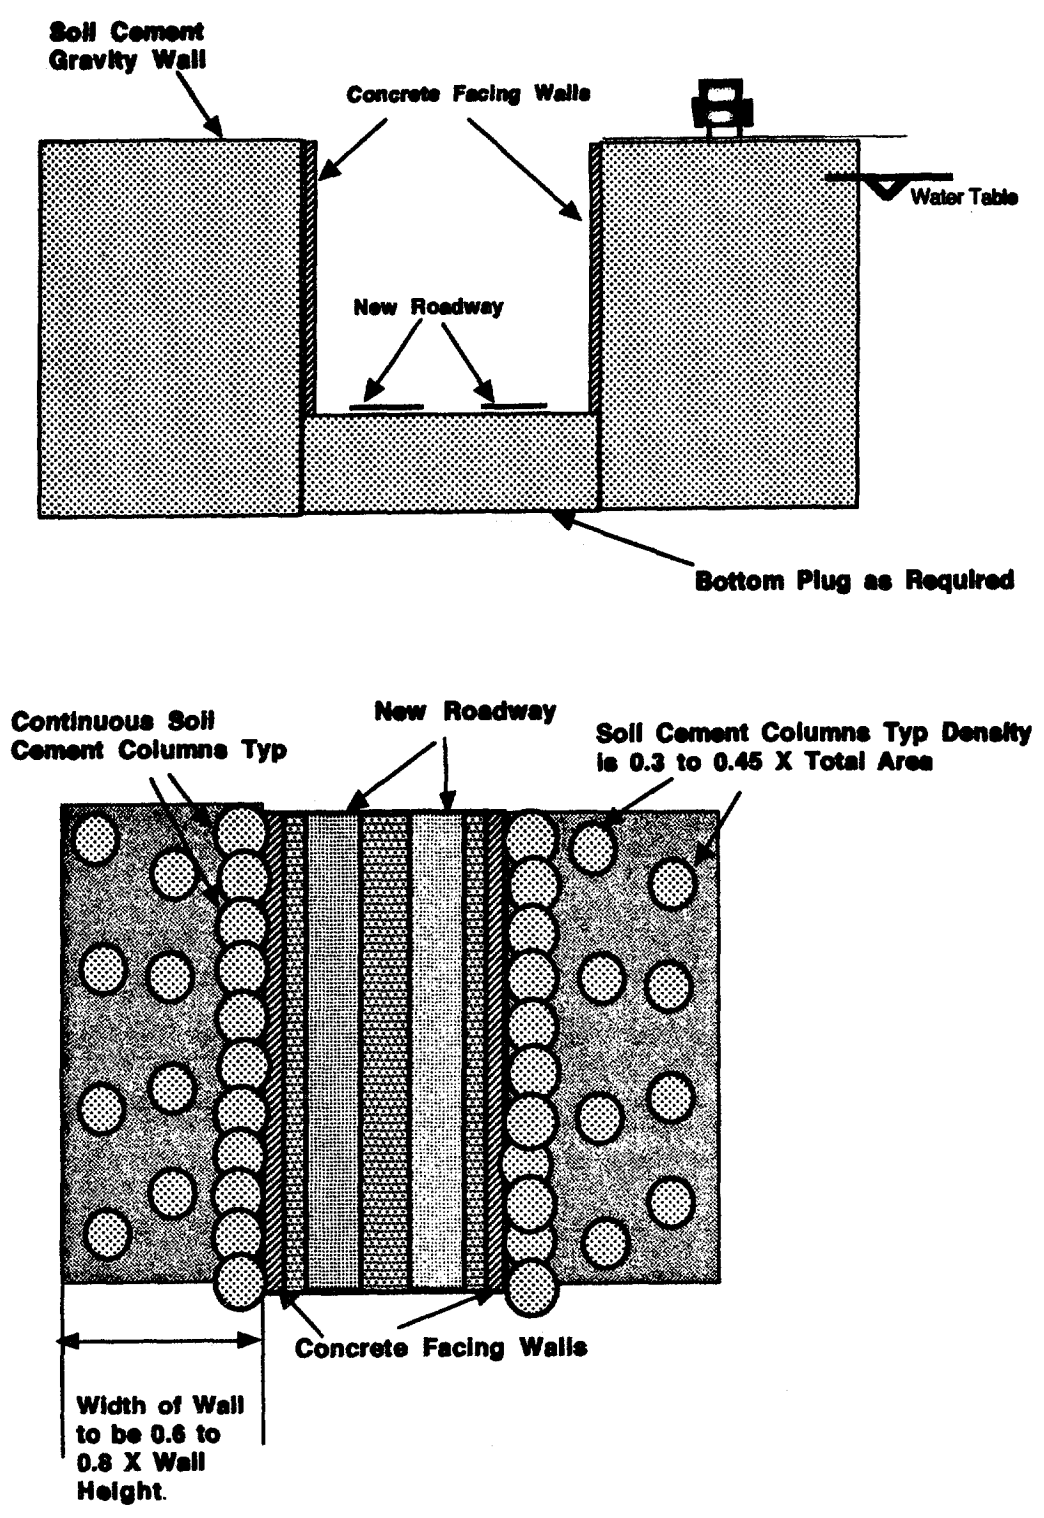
Cross section and plan layout of "VERTwall" (Geo-Con, Inc., 1998).
